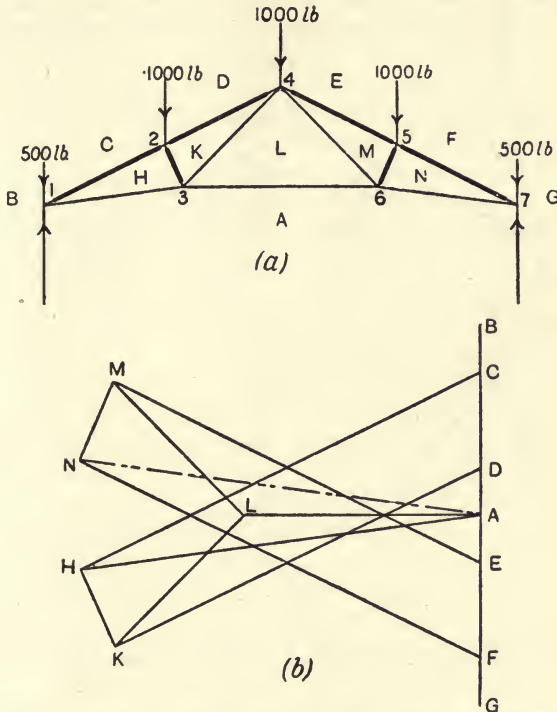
Forces in a common type of roof truss; weights only considered.
